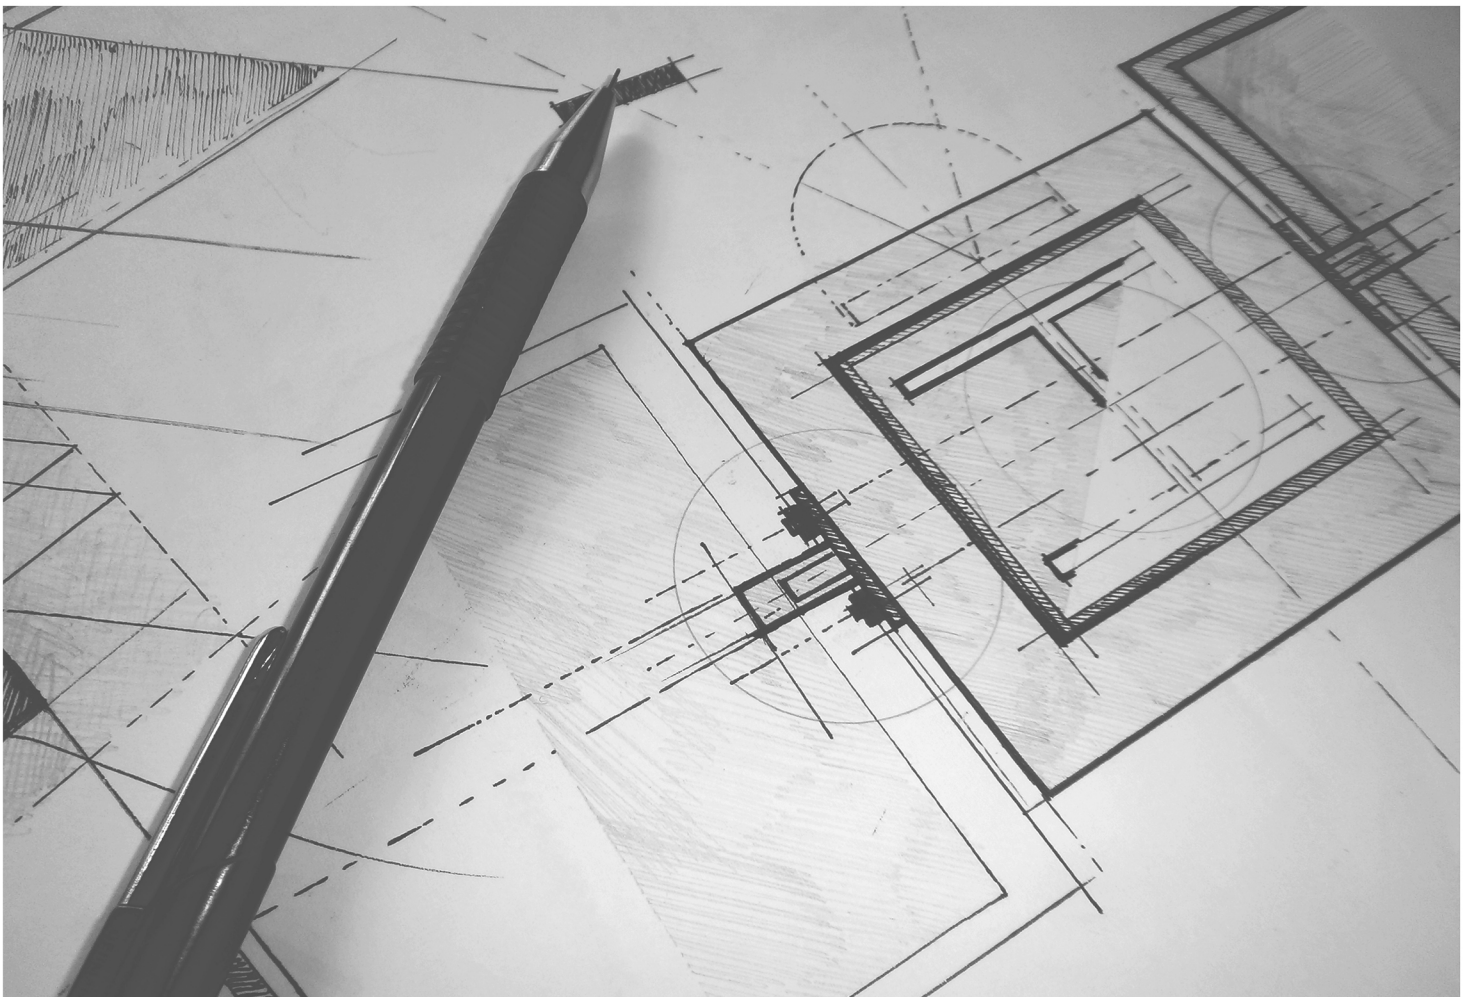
Exploration of detailing | mentis grid walkway | column footing connection | public seating to column connection
